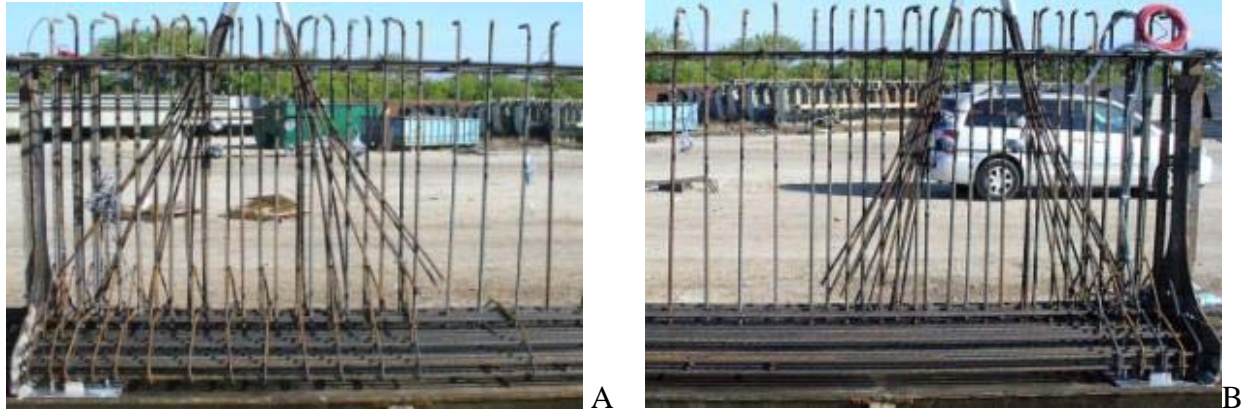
Girder D reinforcement A) Specimen DC and B) Specimen DM
